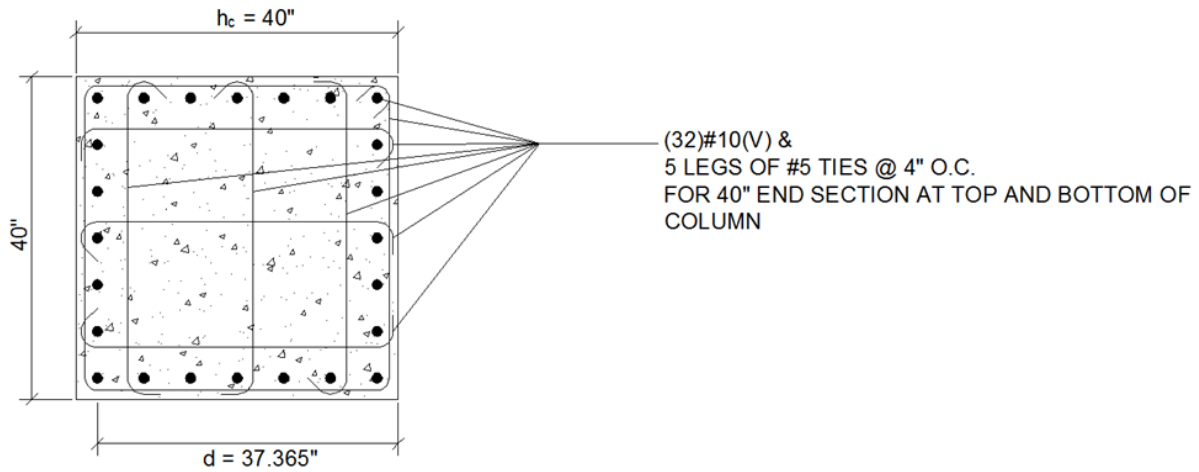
Exterior column, cross section at end section of column at the 2nd floor level based on tsunami design requirements.
